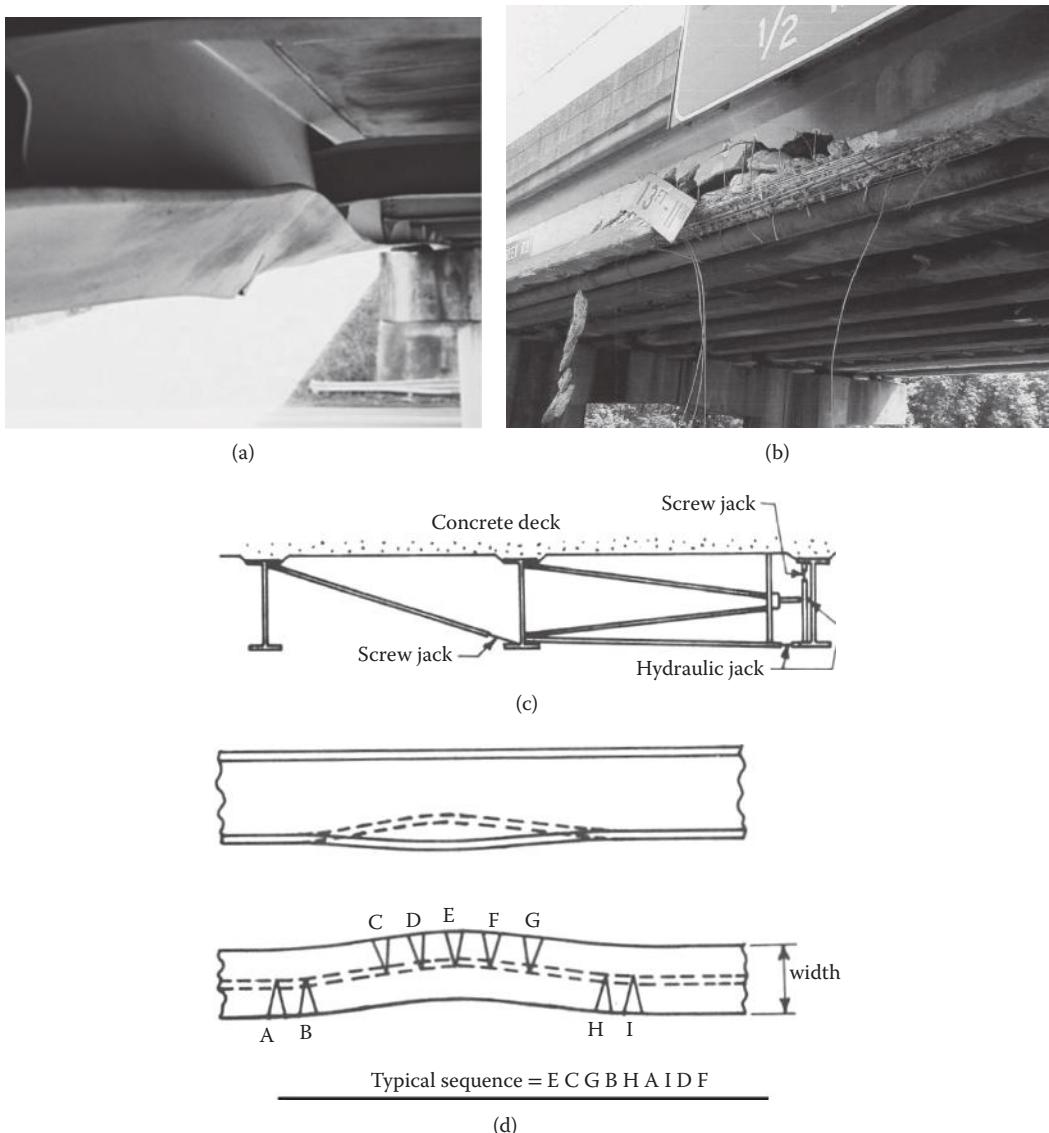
Typical vehicle impact damage and heat straightening repair: (a) steel girder, (b) concrete girder, (c) jacking system, (d) heating straightening sequence. (From NCHRP, *NCHRP Report 222*, Transportation Research Board, Washington DC, 1980.)
